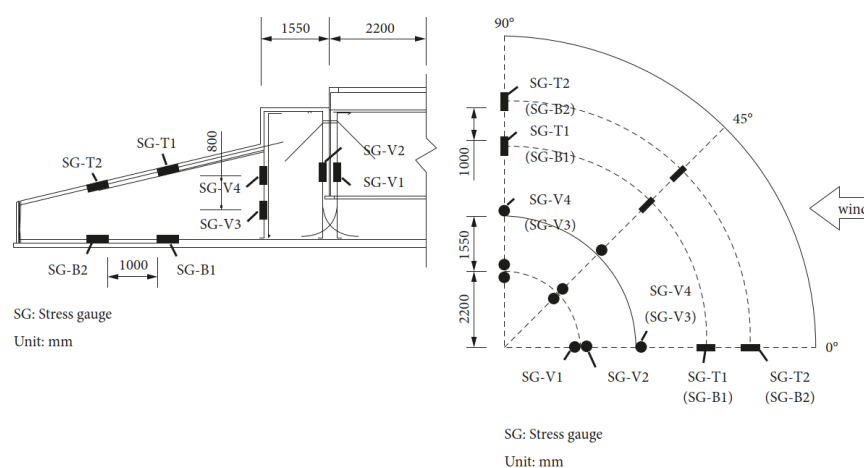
Layout drawing of stress gauges in the foundation [3]
